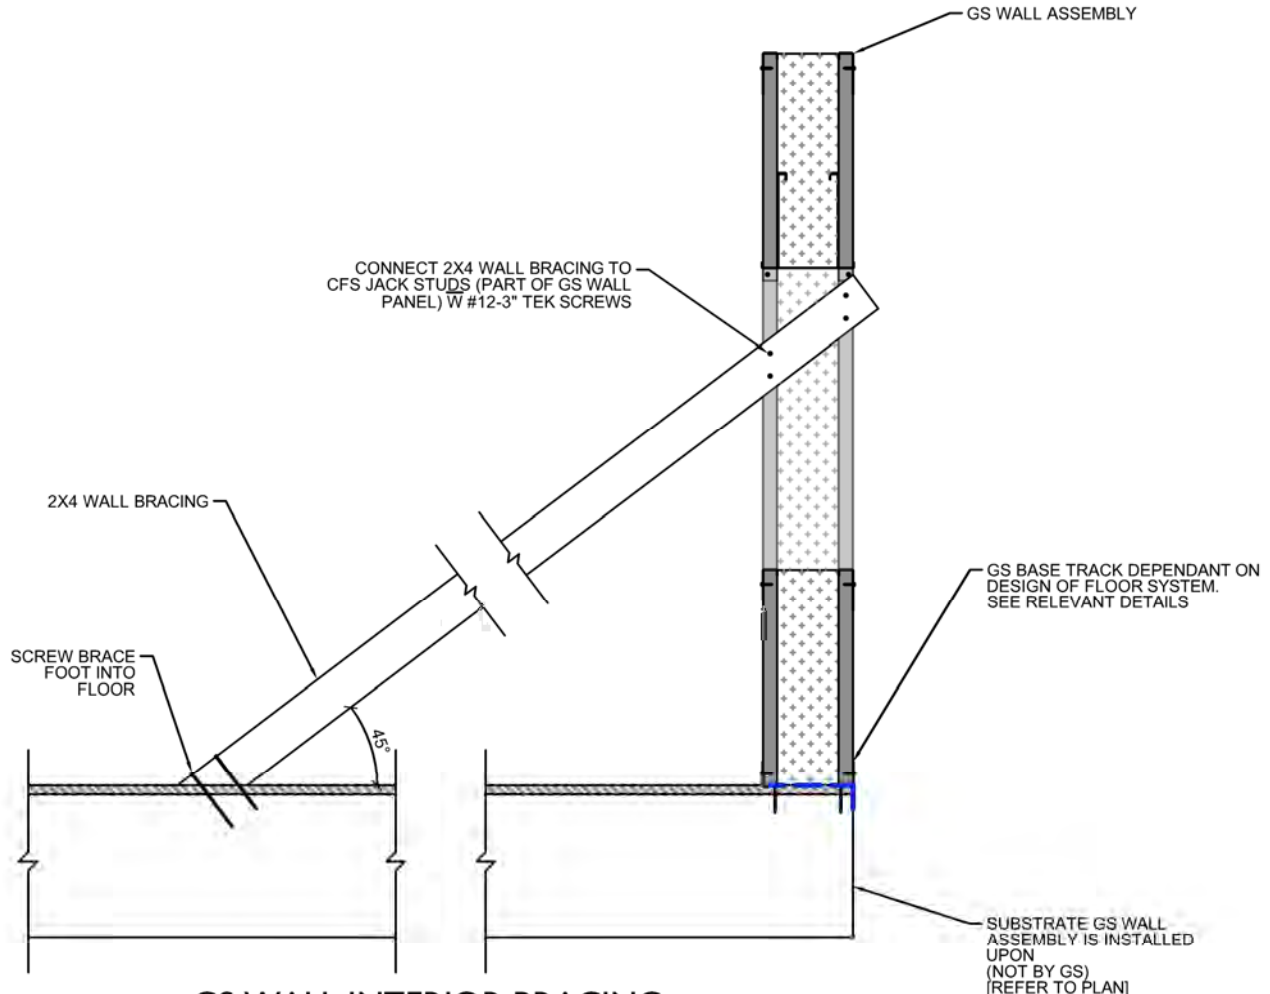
DETAIL ONLY APPLIES TO INSTALLING BRACING ONTO FLOORS W NO CONCRETE COMPONENT
